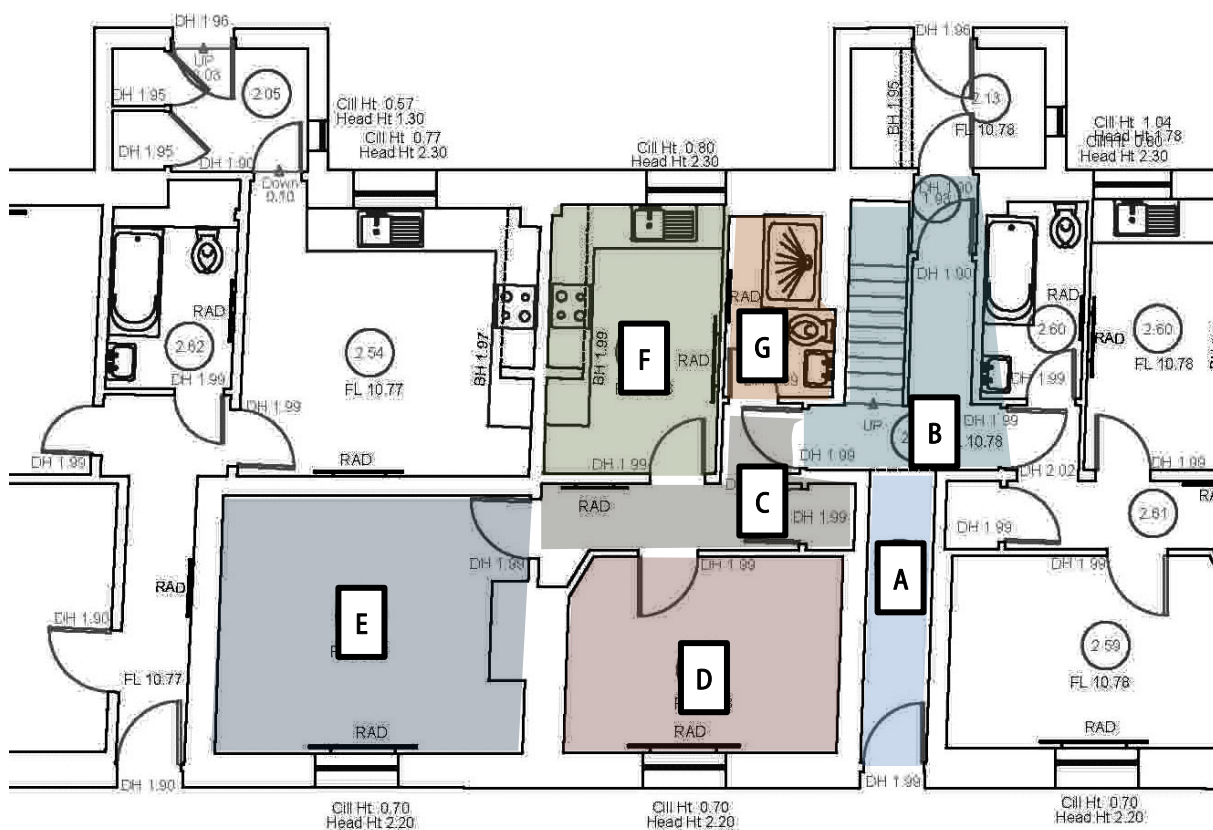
Extract from existing ground floor plan showing Flat 16 (Rooms C to G) and its adjoining circulation (Rooms A and B). Room letters are those used in the images included below (Spatial Geomatics Ltd)
